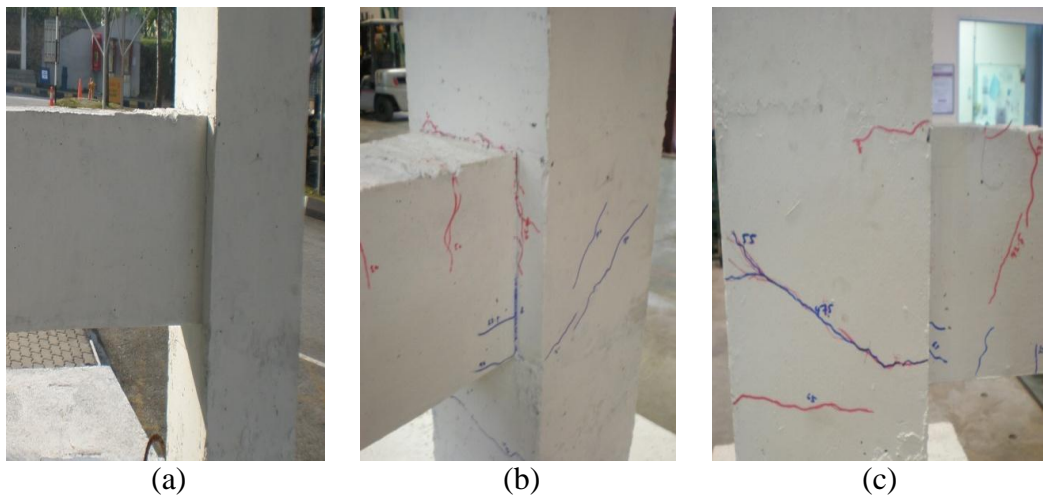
Minor damages occurred in Specimen 3 with additional of cross-bracing in the joint; (a) no cracks at beam-column interface at 0.2% drift; (b) diagonal crack at bottom column; and (c) diagonal and top diagonal cracks in the column and beam.
